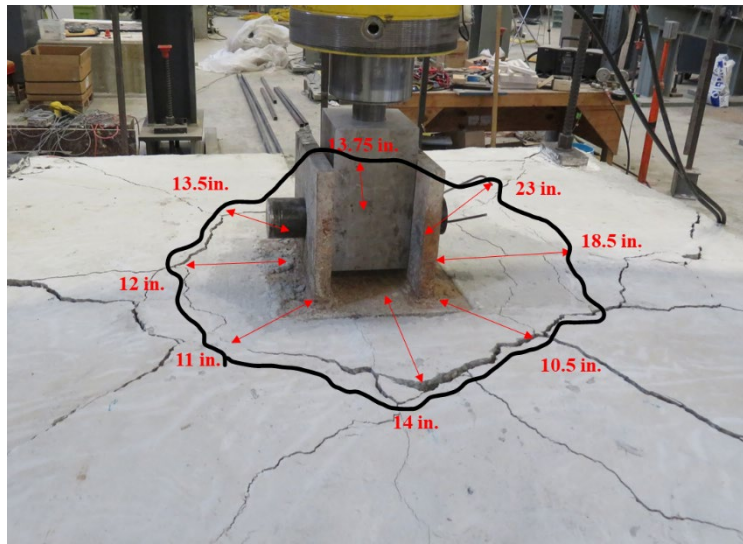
Plan view of cracks formed on the concrete surface
